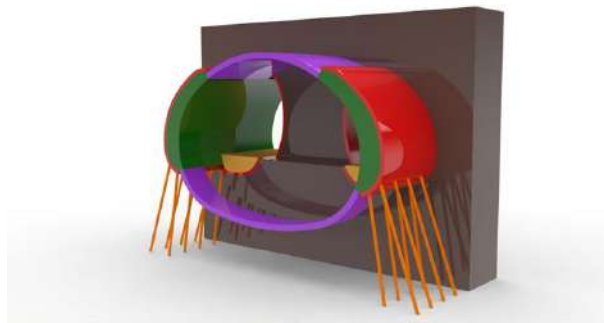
Tunneling concept cross-section Leo-Slezak-Gasse (Source: IGT Geotechnik und Tunnelbau).
